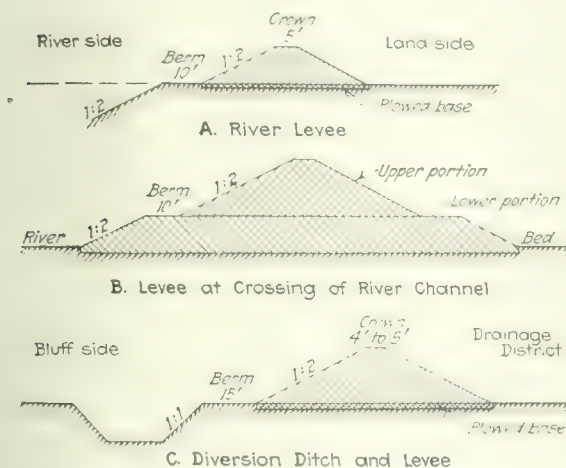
SECTIONS OF LEVEES AND DIVERSION DITCH
